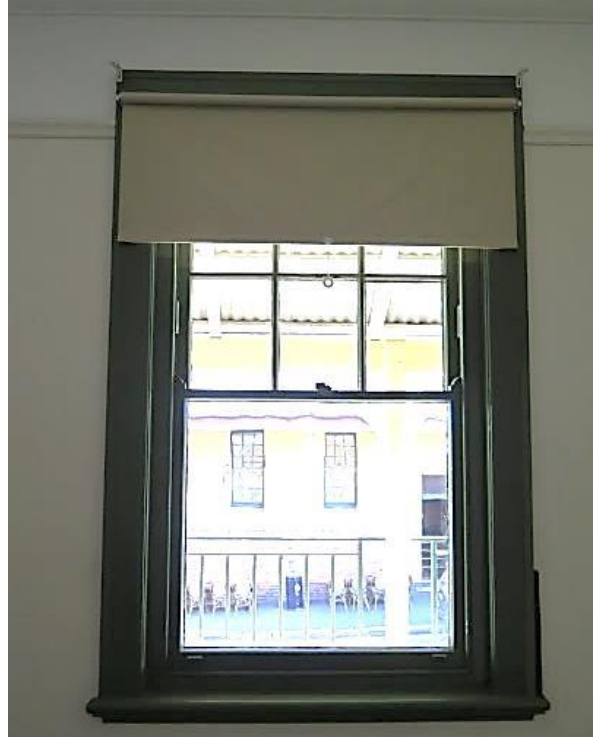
Timber double-hung sash window, architrave and sill board in front bedroom (space 1.2)—48A / 46–56 Gloucester Street. (Source: GML Heritage, May 2015)
